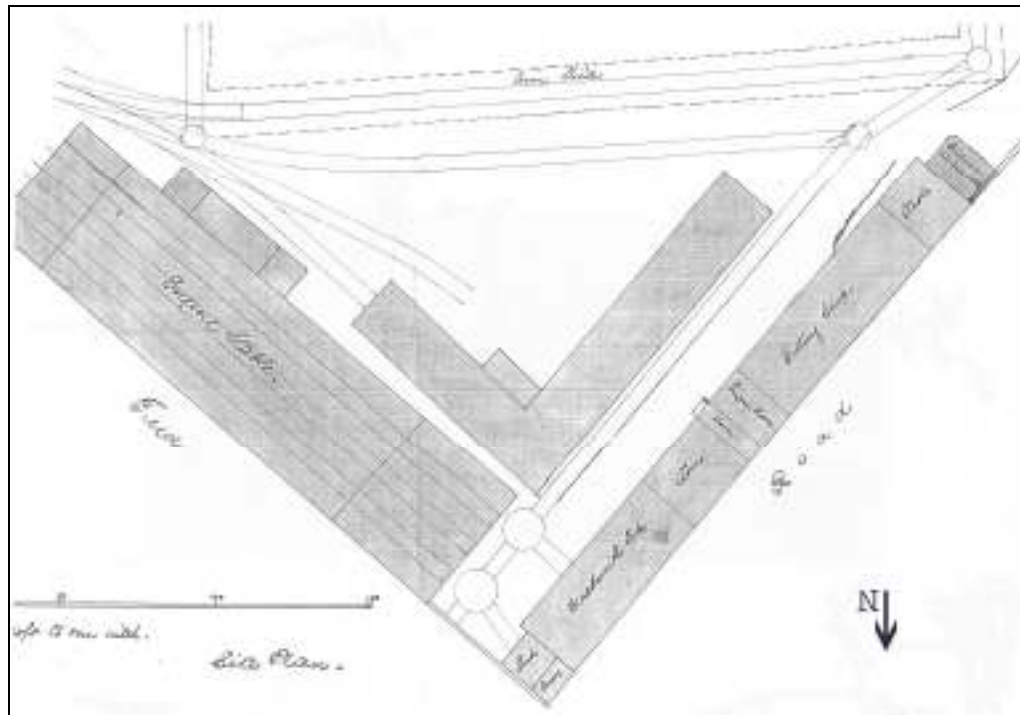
Proposed addition of 2-stall stable at south-western end of long range 1872
